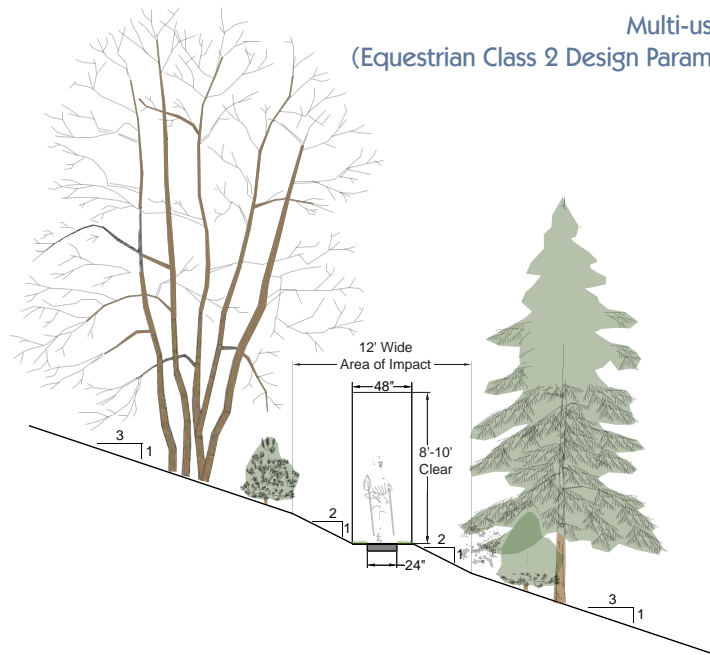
Section 36 Trail Cross Sections on a Moderate (7:1) Slope
